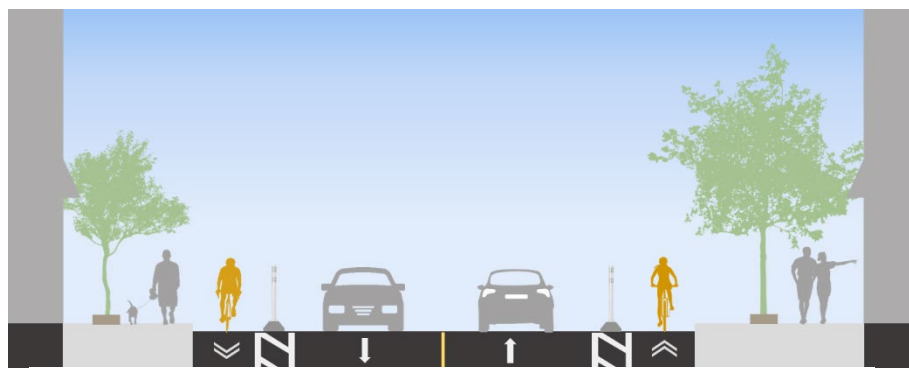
Illustration showing the proposed uni-directional cycle tracks on Bedford Road between Bloor Street West and just south of Prince Arthur Avenue facing north.
